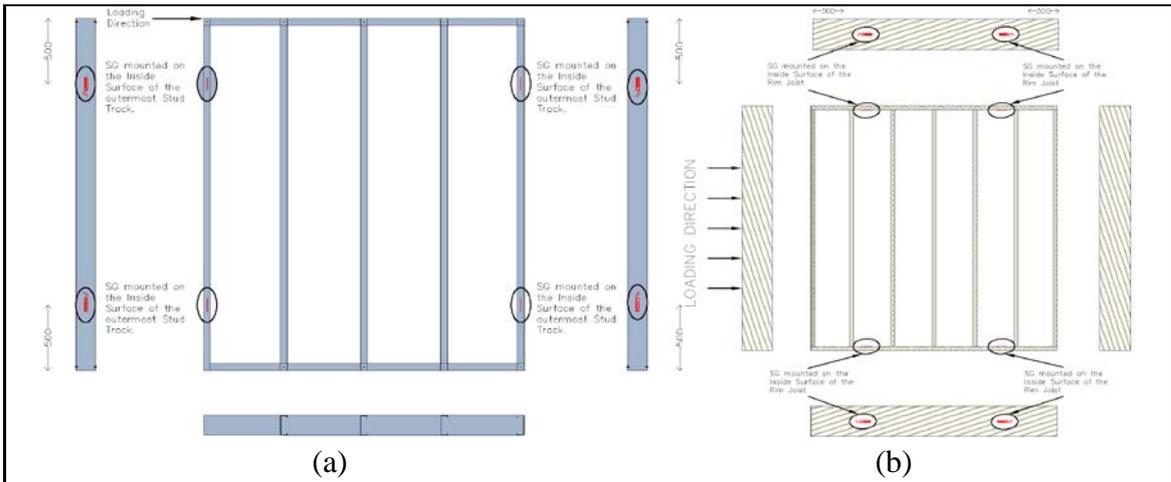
Strain Gauge Layout (a) CFS01 Wall (b) WOOD01 Diaphragm
